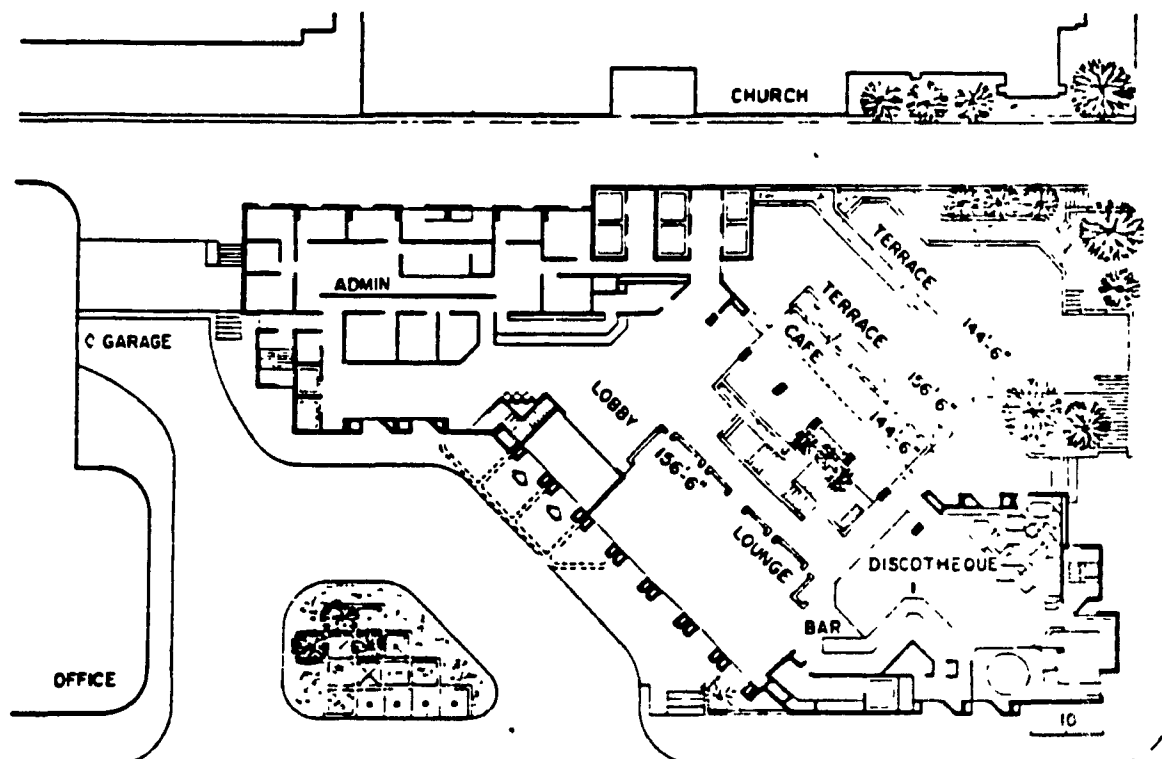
Hotel street level plan and the terrace, La Cite, Montreal.
